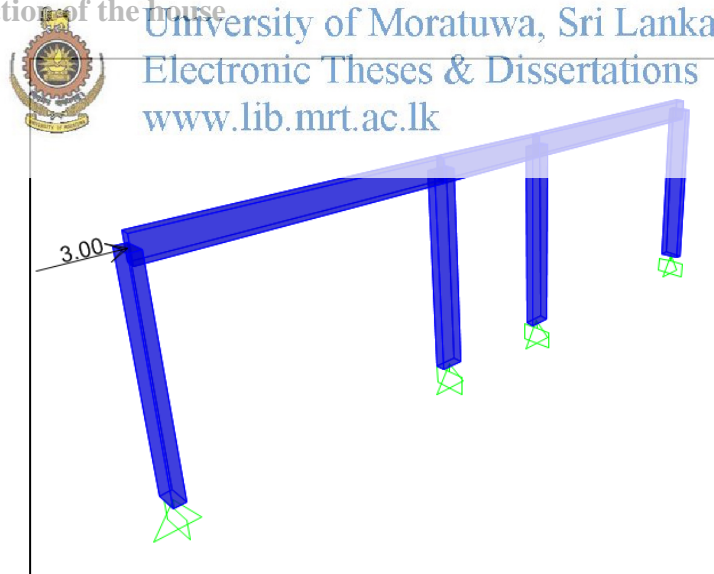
Frame resisting a lateral load parallel to the longer direction of the house
